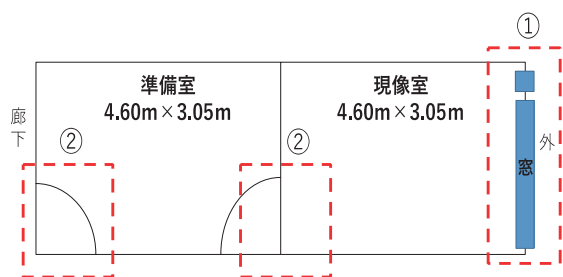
Floor outline of the development and preparation rooms with shade enhancement points⁸⁾.
